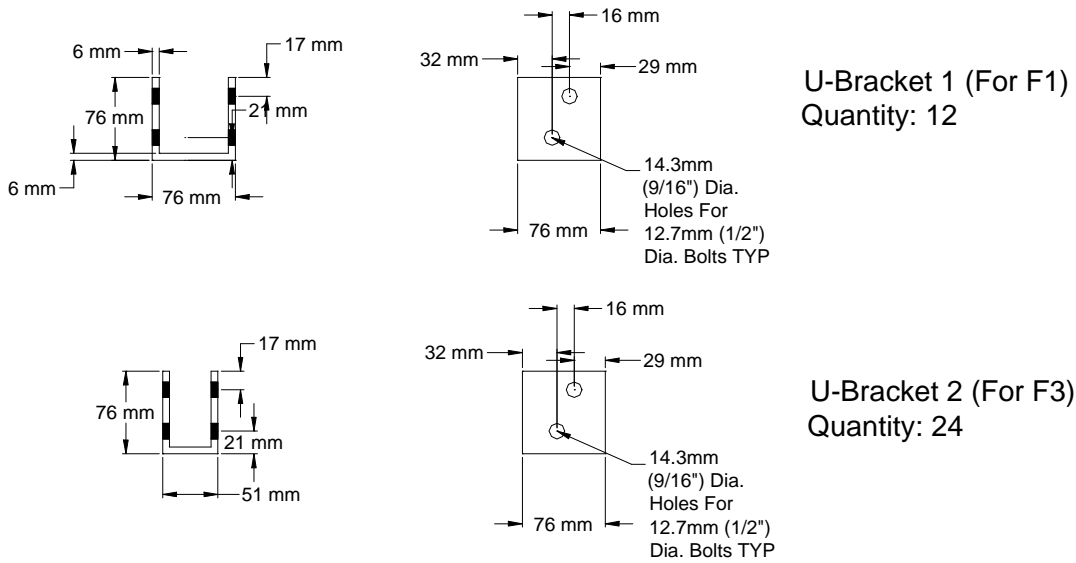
U-Brackets for Brace-to-Cold Formed Steel Stud Connection
